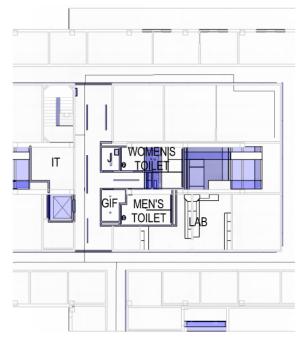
Phasing Diagram New Floor Plan, Level 3
